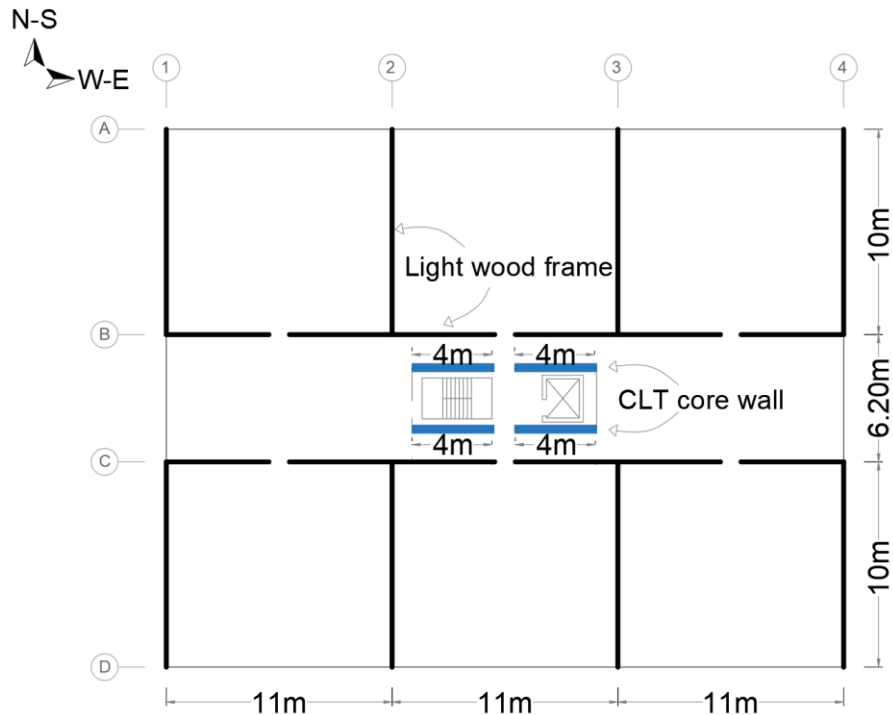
Layout of the hybrid building containing LF wood shear walls and CLT core wall.
